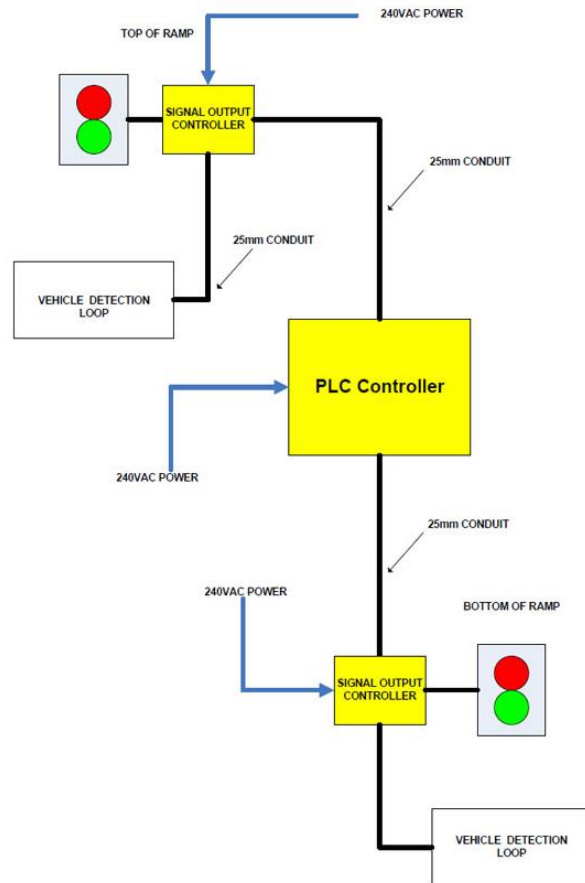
WIRING DETAILS FOR TRAFFIC LIGHT SYSTEM
